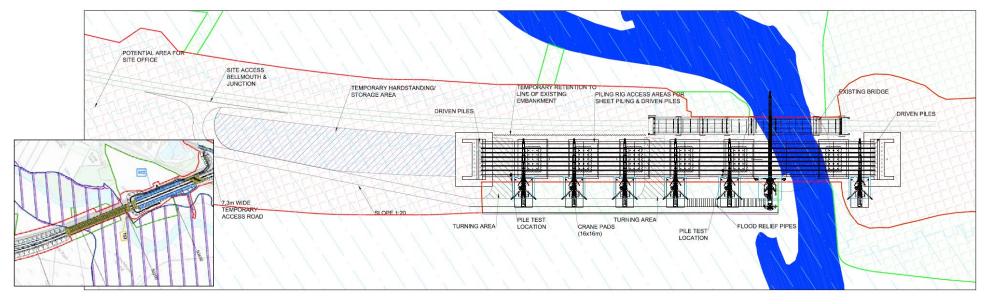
Indicative crane and steelwork access showing temporary access bellmouth from A9, and ramp created between existing and new A9 embankments
